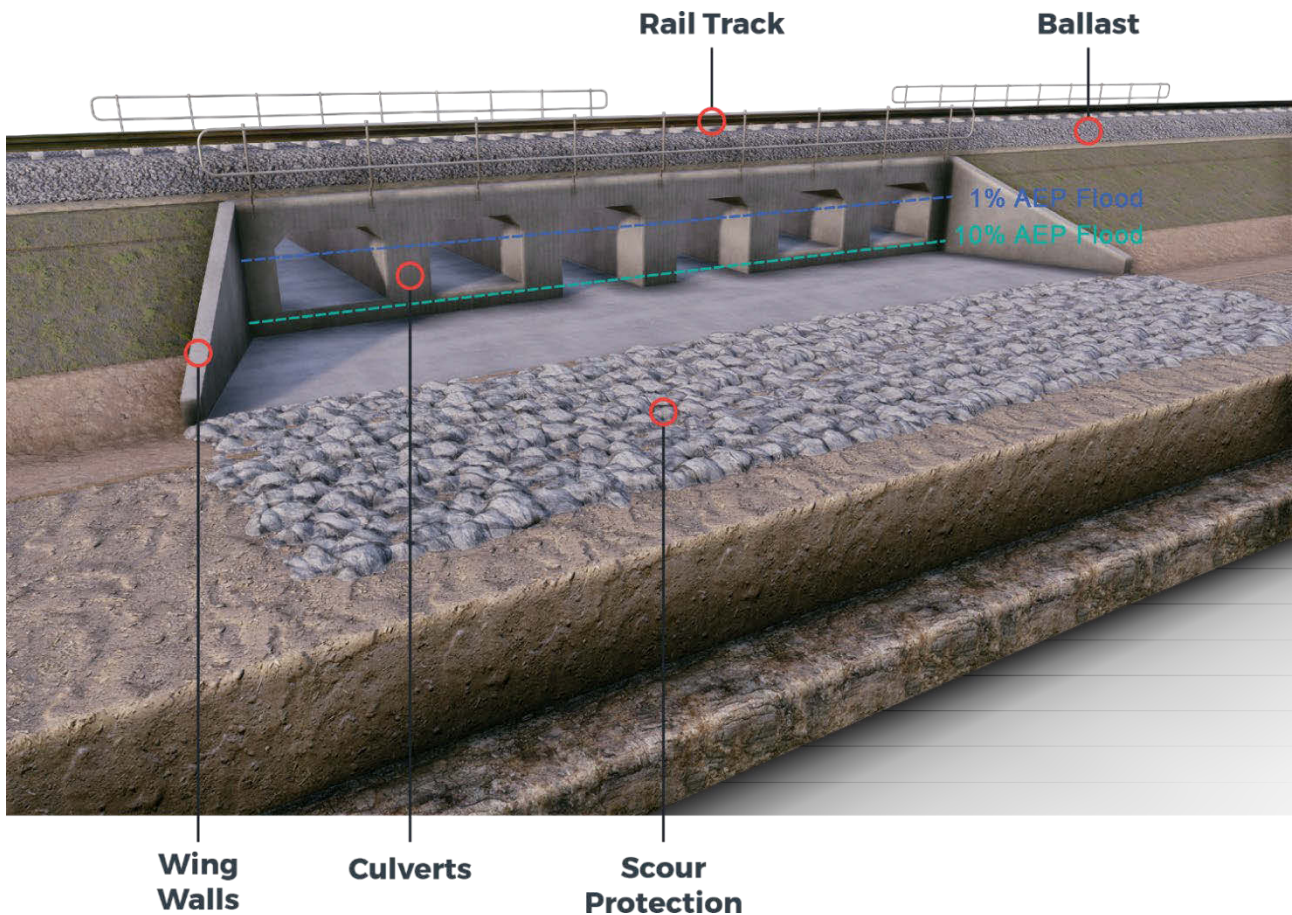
Visualisation of typical floodplain culvert bank showing variable culvert floor levels
